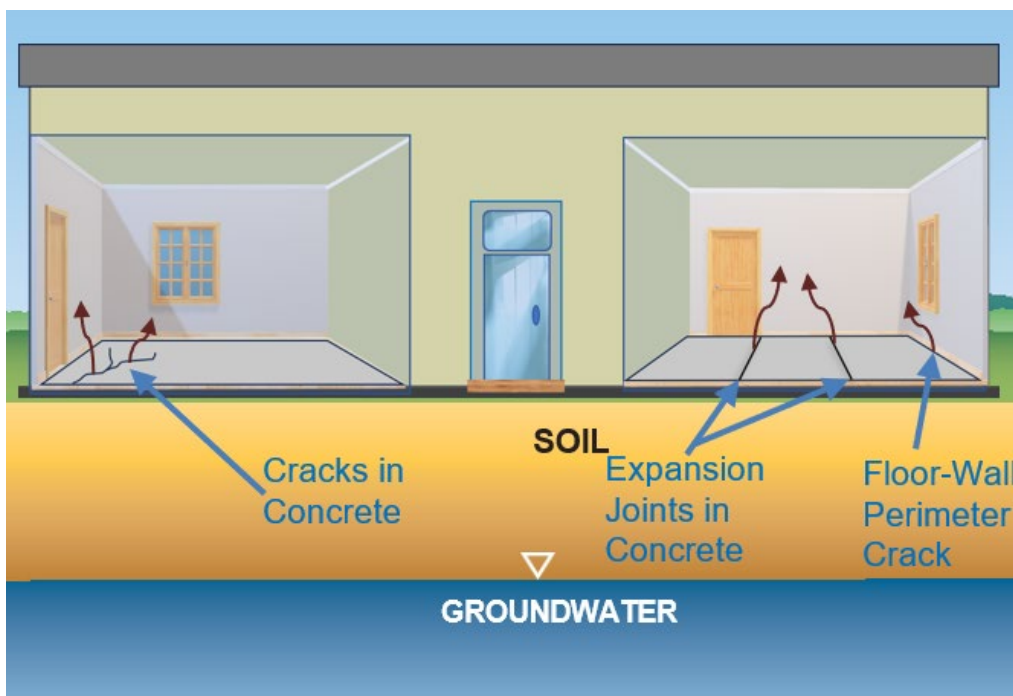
Example of slab cracks and expansion joints that may be vapor entry points.
